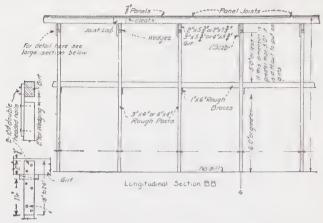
Flat slab floor forms for interior floor bay. Side view.
